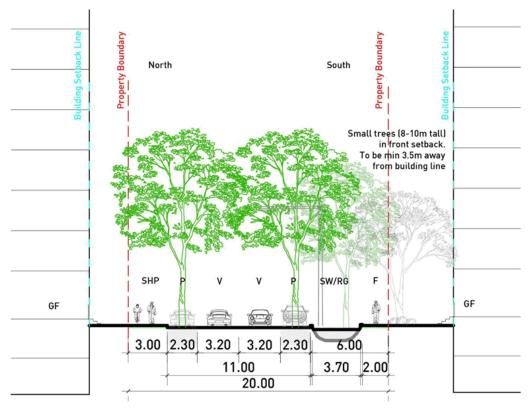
Type 3 Main East West Connector road (EWR 4)
